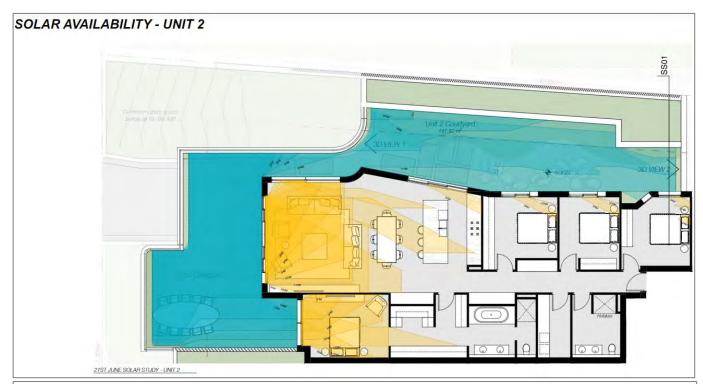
Extract of DWG No. 9404. As outlined in a yellow, the bedroom layout in Unit 2 has been amended to step out into eastern elevation providing improved solar access (Source: MHNDU)
